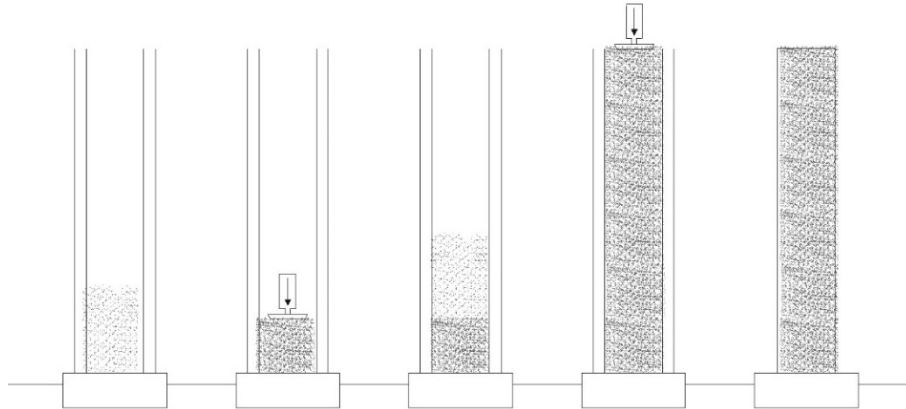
| Moist soil mix is compressed layer by layer between two panels molding a rammed earth wall.
